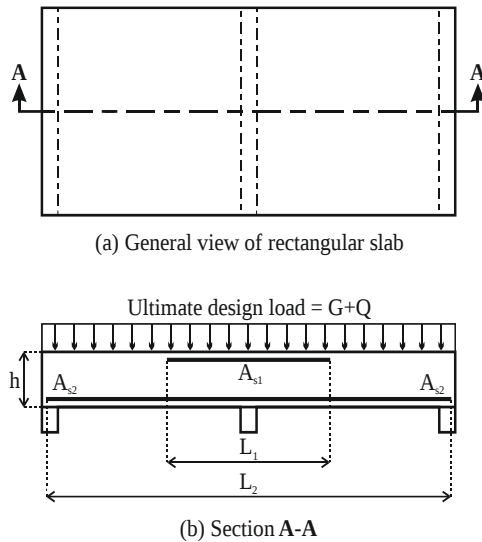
Reinforced concrete slab: (a) General view, (b) Section A-A.
